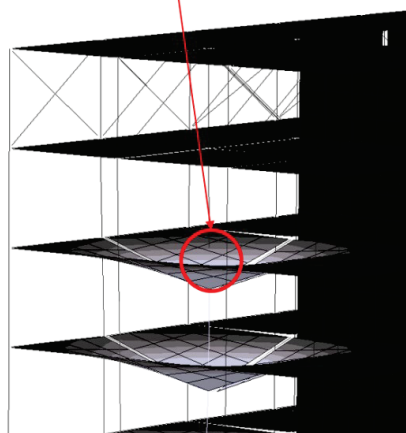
Scenario 3 of design option 2 @0.5 s, column connection axial failure
